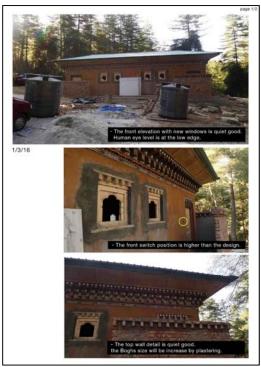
Monitoring reports of Ramthangkha restrooms construction at Taktsang base.
